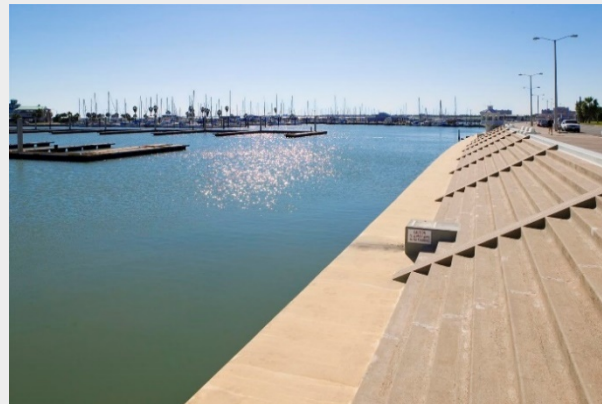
Seawall Profile*. Seawalls have varying profiles; this example has a tiered section (HDR Inc. 2016).
